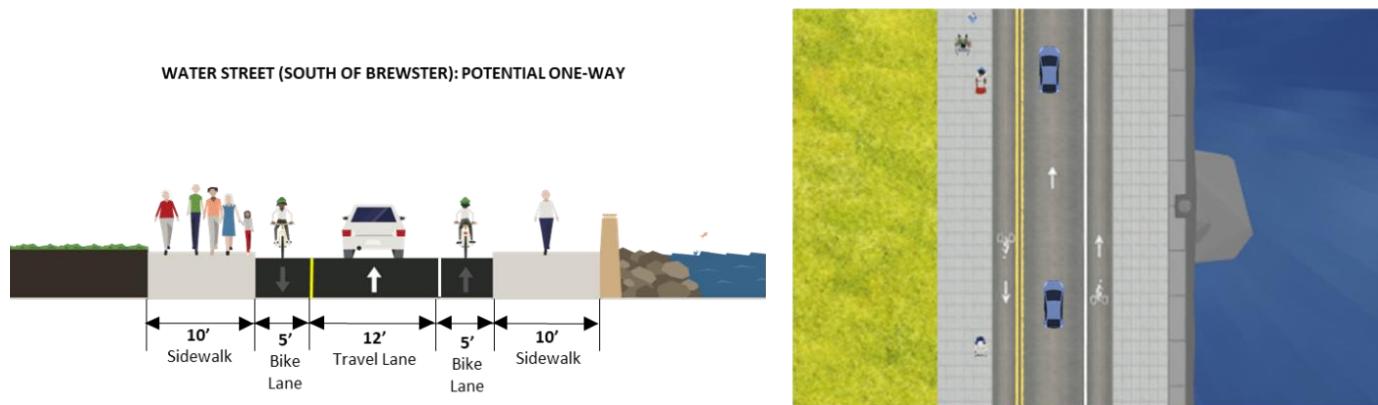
Water Street (South of Brewster Street) Potential One-Way Cross Section
